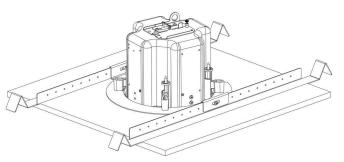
Installing the loudspeaker into a bridge in the ceiling
